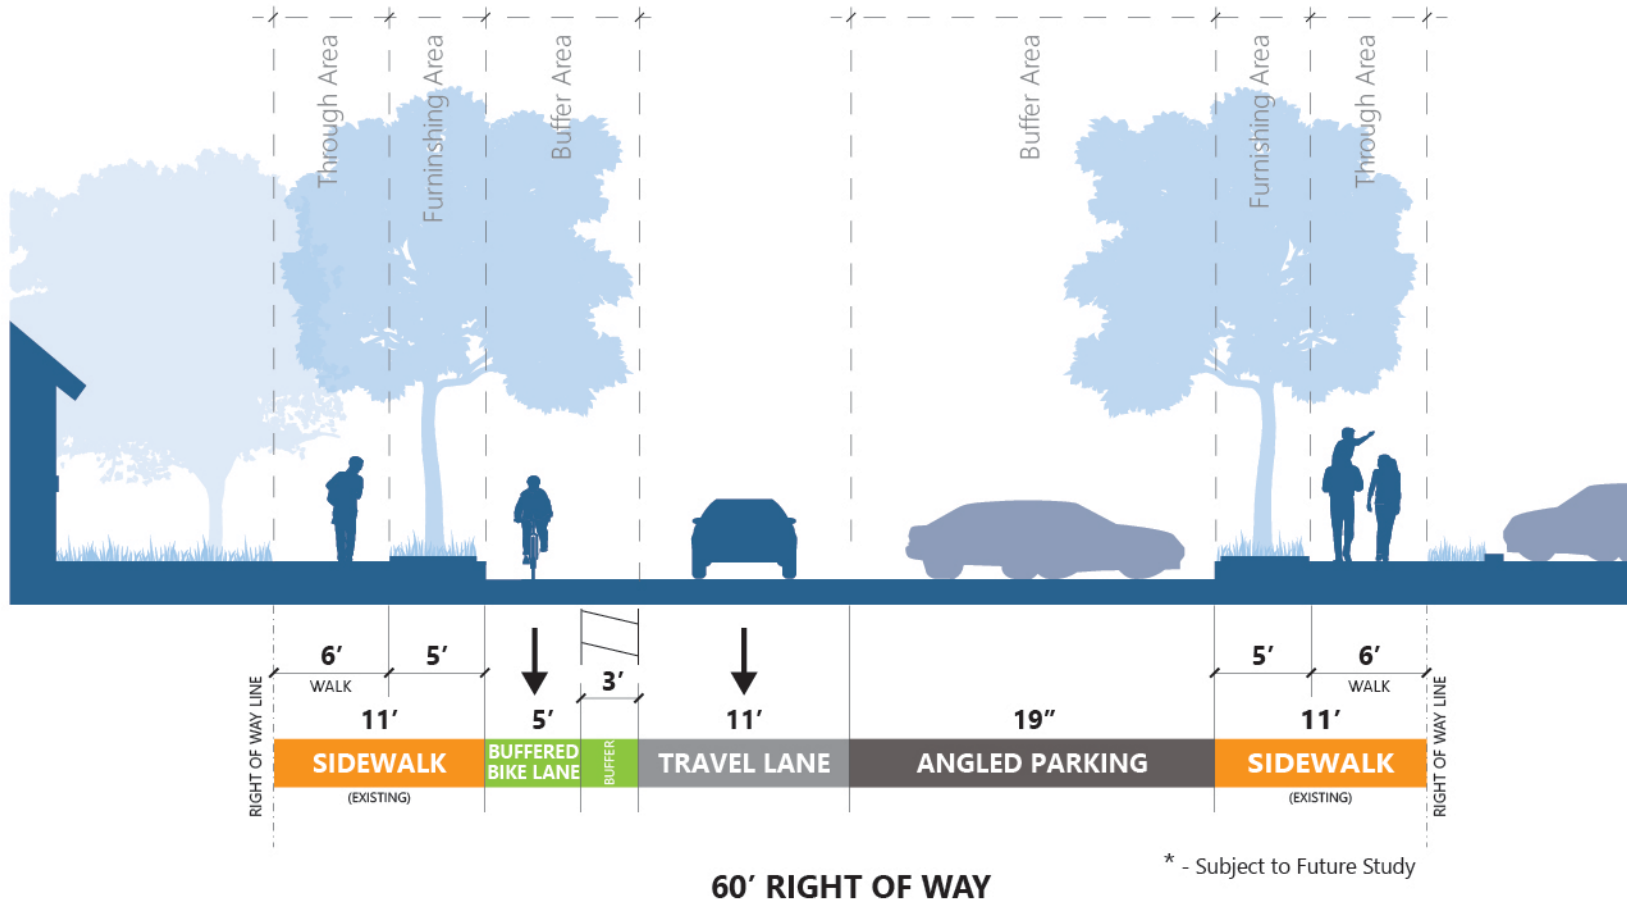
Transit Connector Street – Typical Section (One-Way Alternative)
